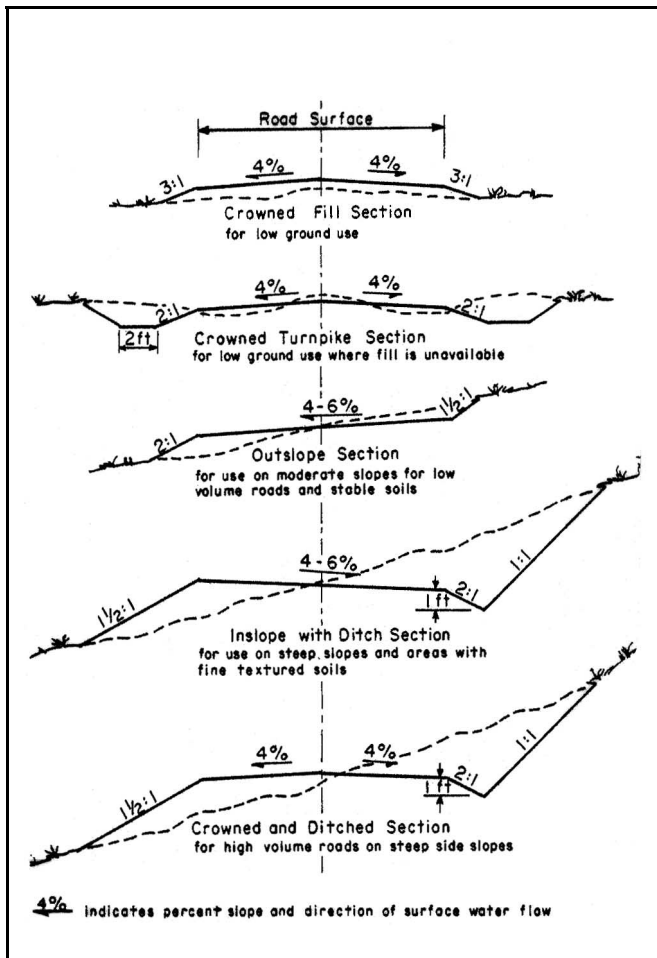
Typical road profiles for drainage and stability. Choice of cross section depends on drainage needs, soil stability, slope, and expected traffic volume. Dashed lines indicate natural land contour and solid lines indicate constructed road (Wiest, 1998).
